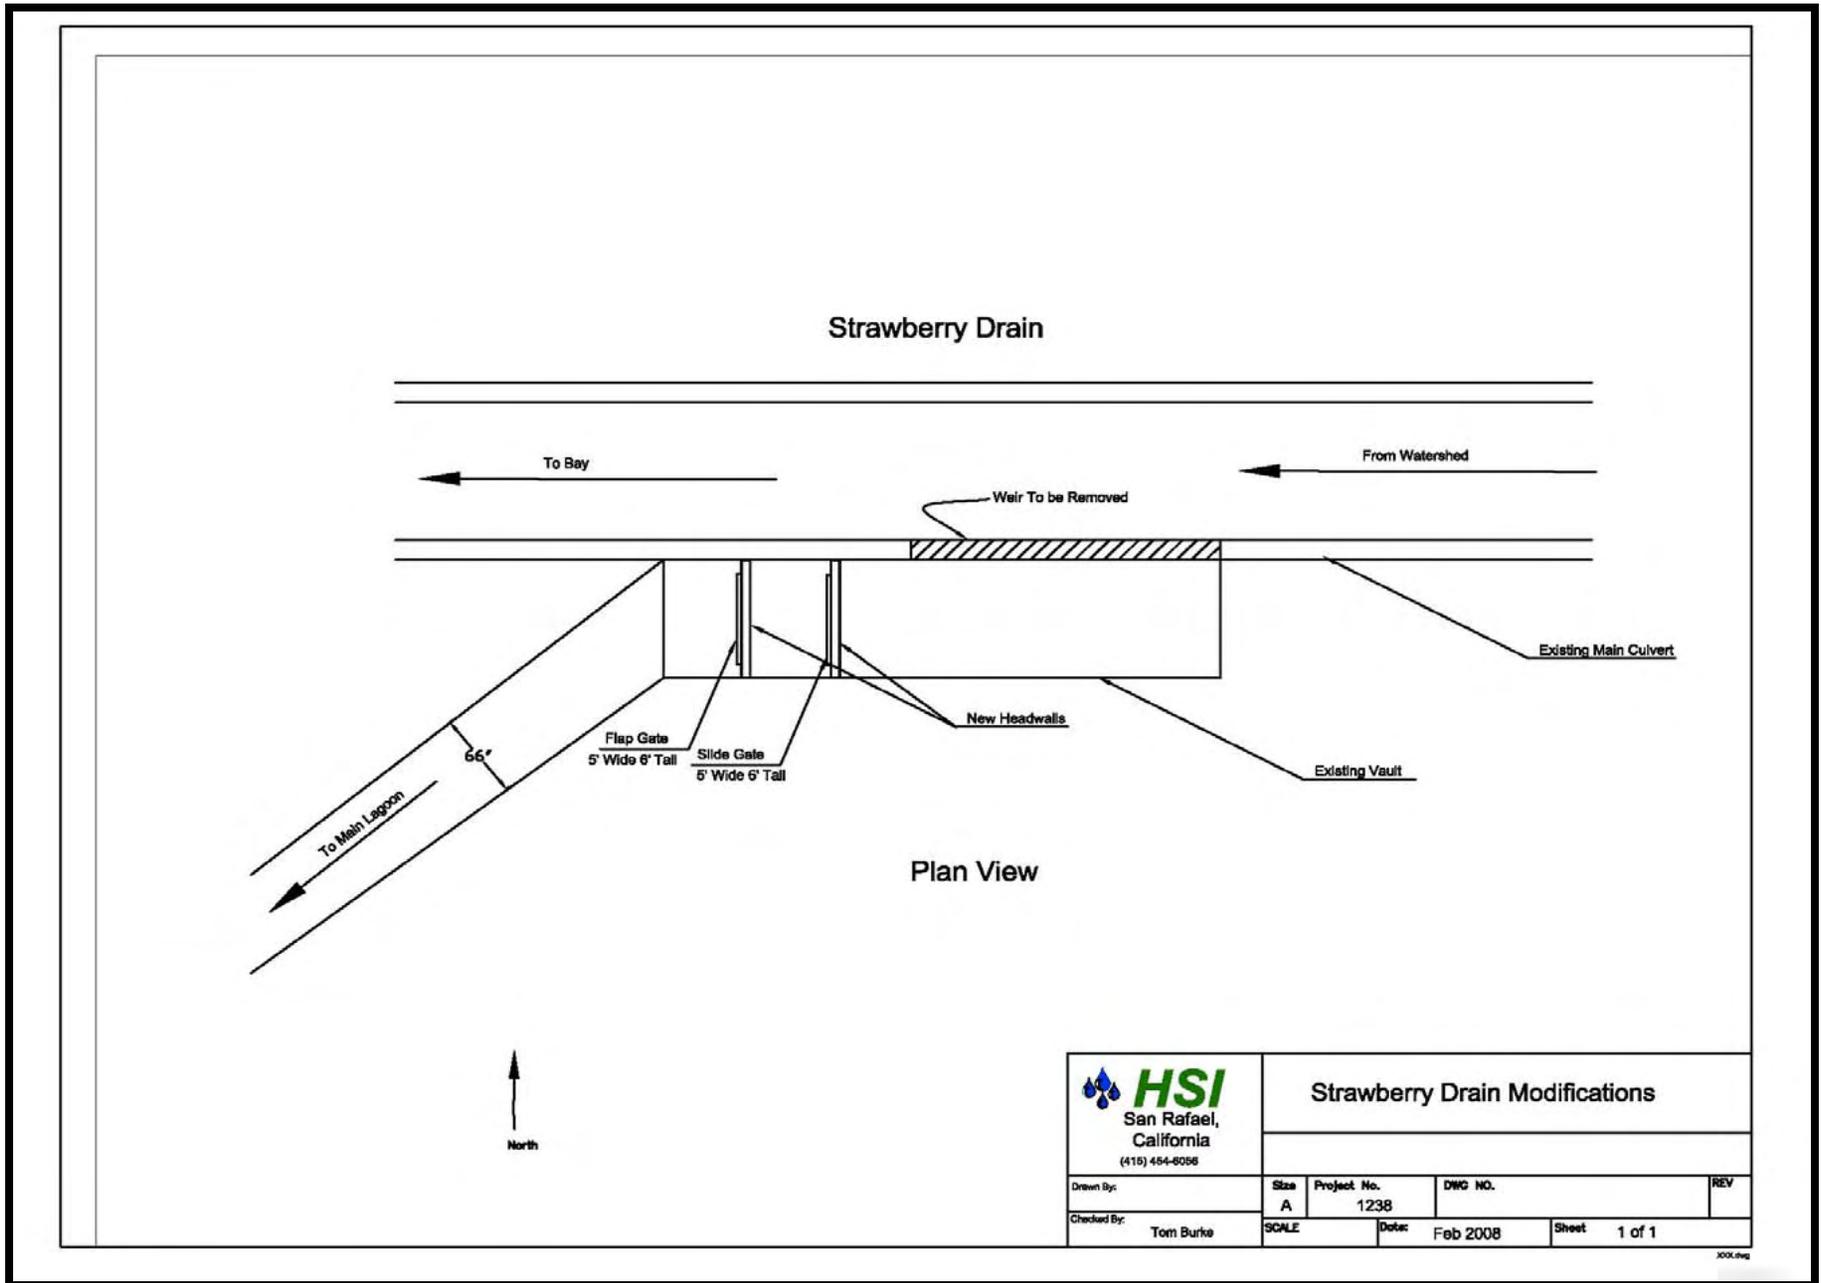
Schematic of New Connections between Strawberry Stormdrain and Connection Pipe to Main Lagoon
